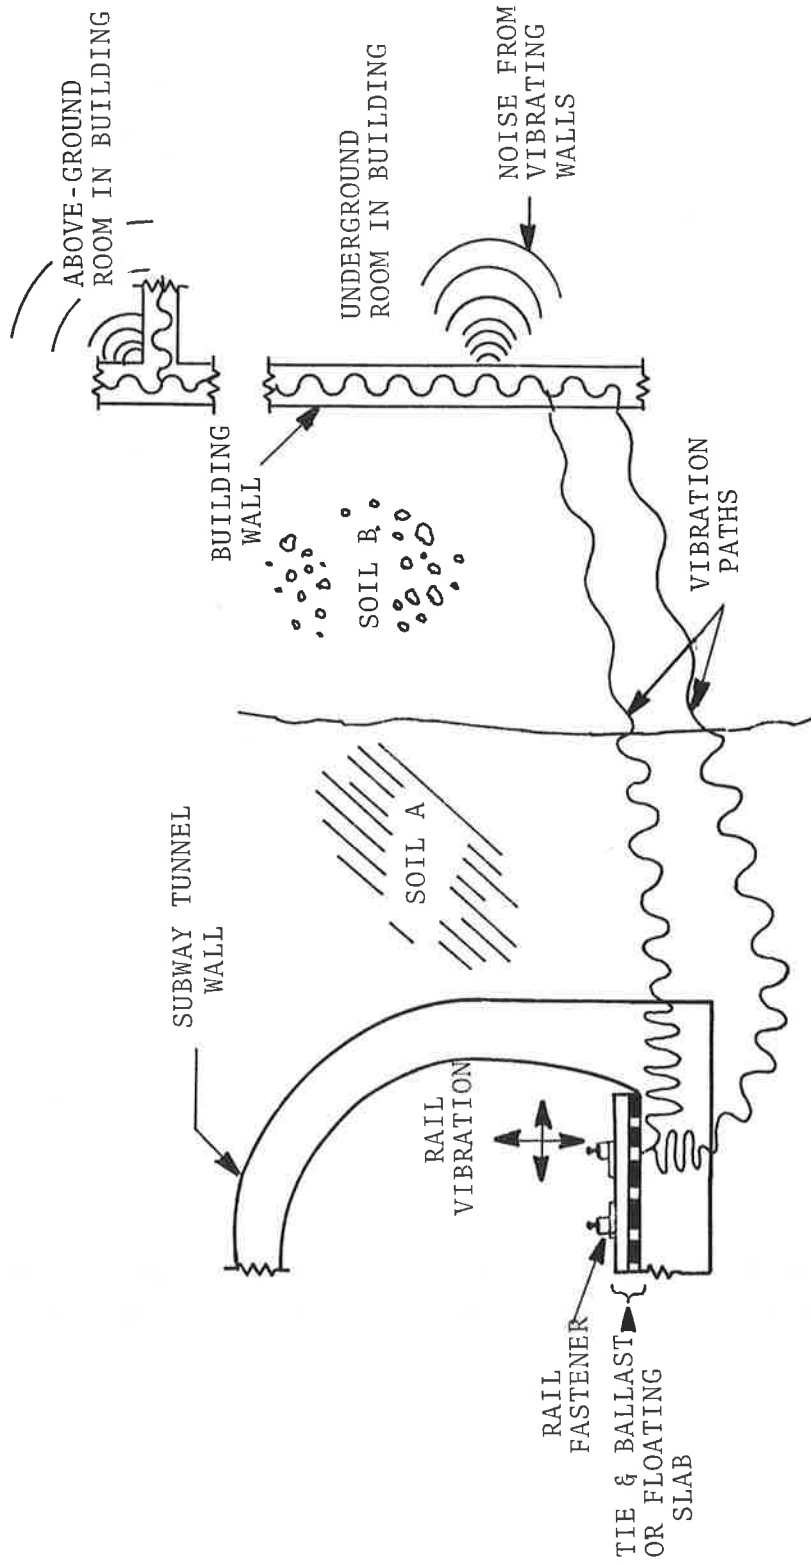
Schematic view of propagation of subway vibrations into buildings. After [Unger and Bender, 1975]
